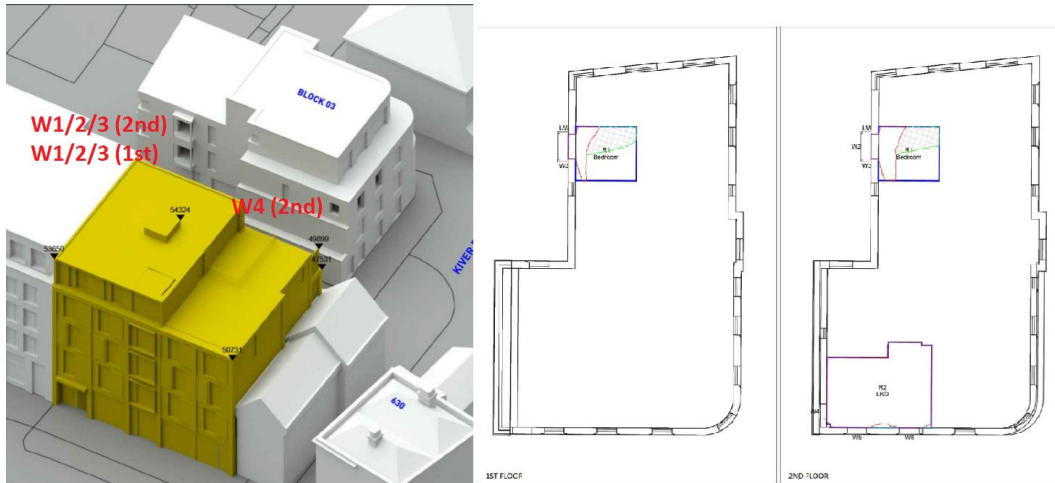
Block 03 Window Map and Internal Daylight Distribution Floorplans
